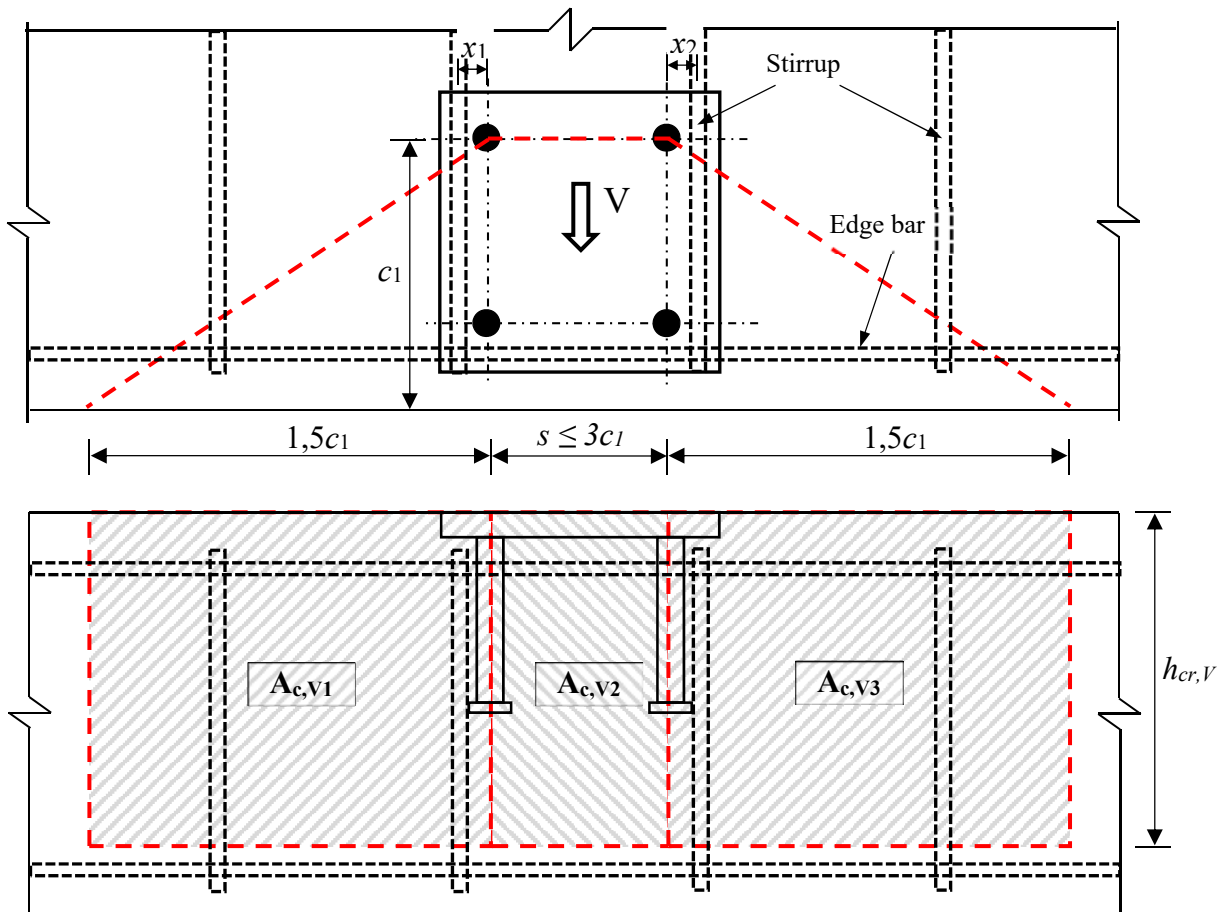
Group with 2 x 2 headed studs at the edge of a concrete member with stirrups beside the anchors, taken from [9]
